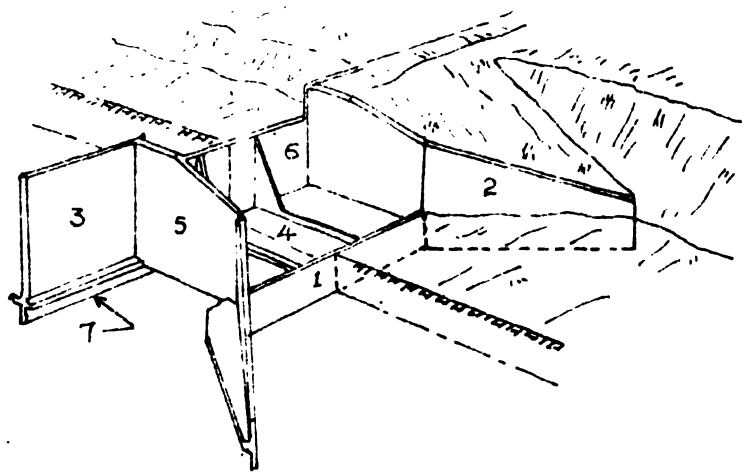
Drop spillway showing structural components. (1) Toe wall, (2) Wing wall, (3) Head wall extension, (4) Apron, (5) Side wall, (6) Head wall, (7) Cutoff wall.
